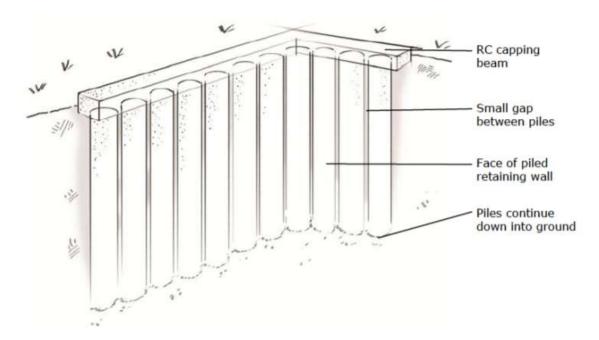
Indicative arrangement of a contiguous piles wall.
